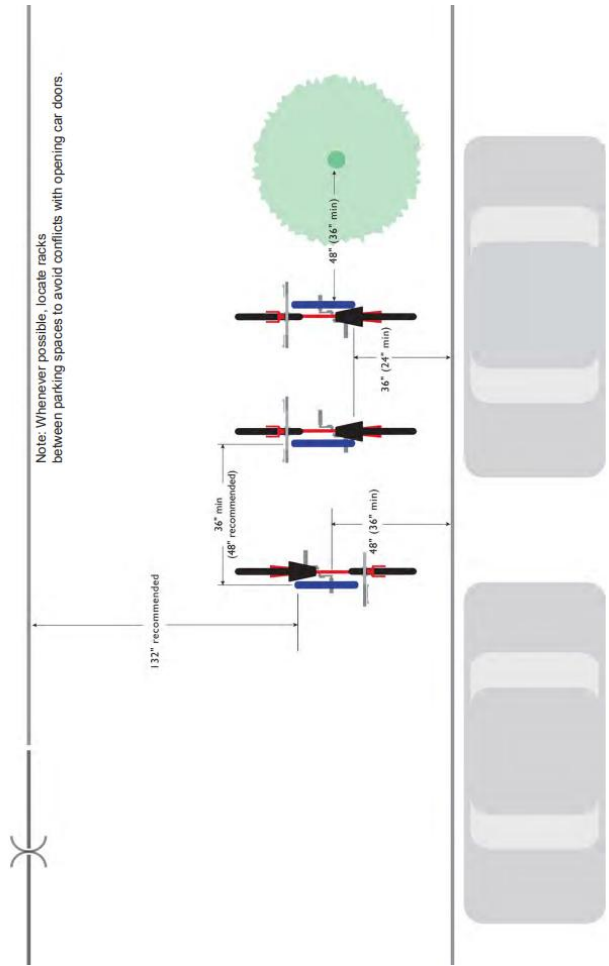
Typical Layout of Perpendicular Sidewalk Bike Parking Installations (Source: APBP<sup>2</sup>)
